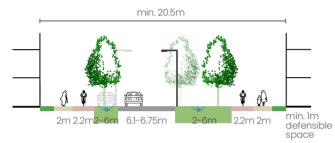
Secondary street precedents with trees and landscape on both sides with some on-street parking
